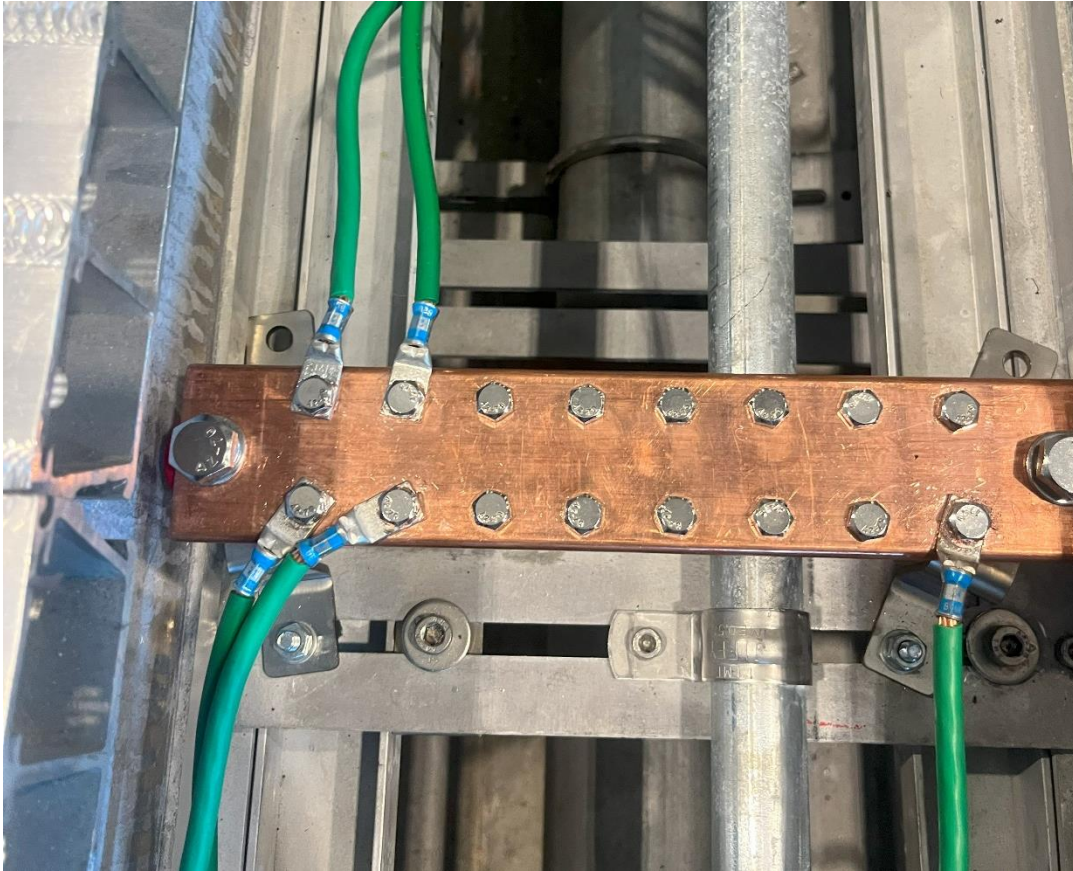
Grounding Bus installed in ILDFA prefabricated aluminum trench for termination of grounding points.
